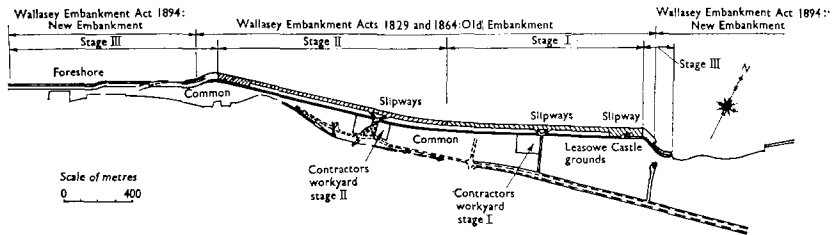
Plan of embankment showing extent of each stage of the current reconstruction programme
